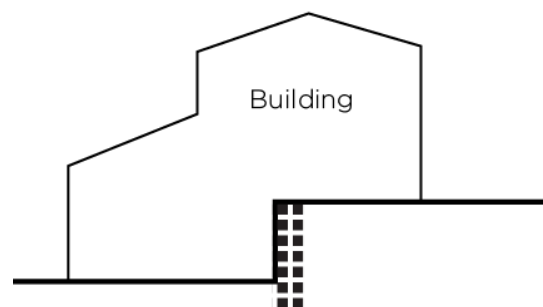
G, RETAINING WALL WITHIN STRUCTURE
